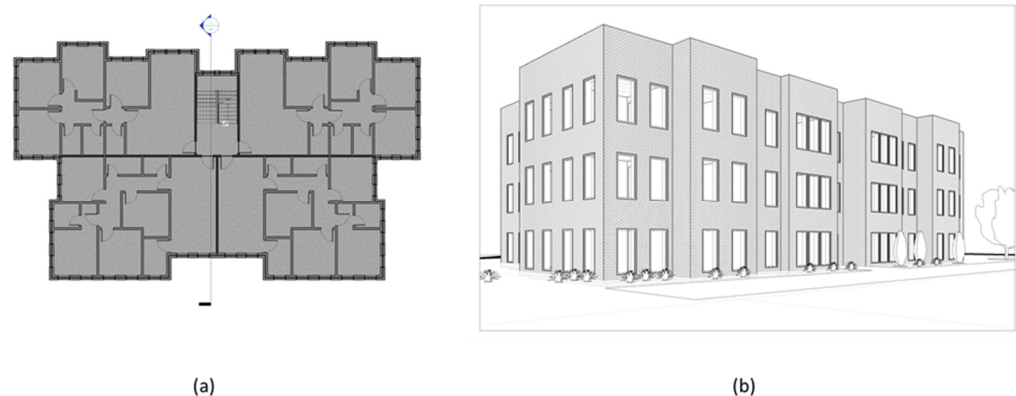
Building model using Building Information Modelling (BIM). The figure in (a) is the floor plan showing the detailed floor plan view of the modelled building and the figure in (b) represents the final 3D view of the complete building.
